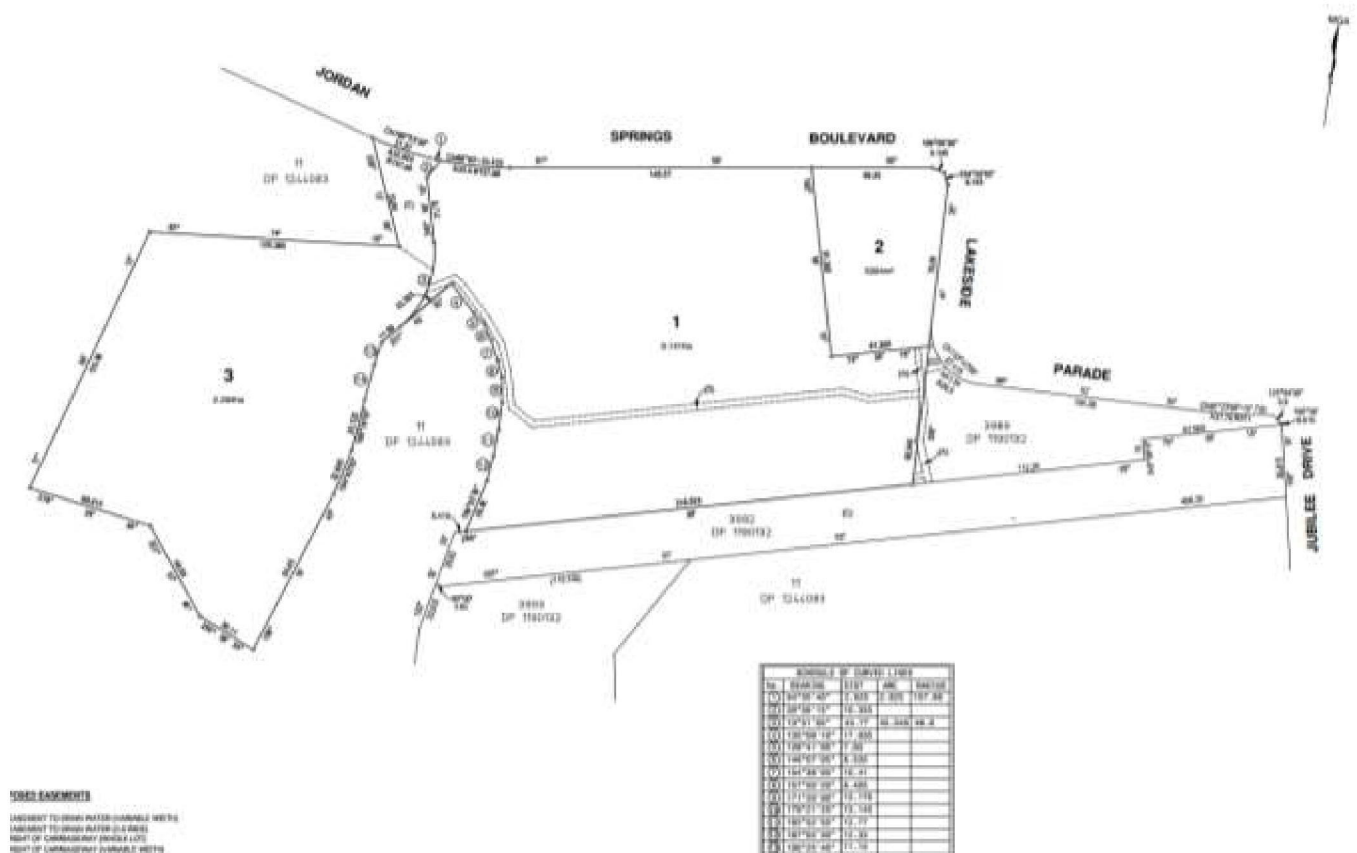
Plan of proposed subdivision (Source: SDG Land Development Solutions)
